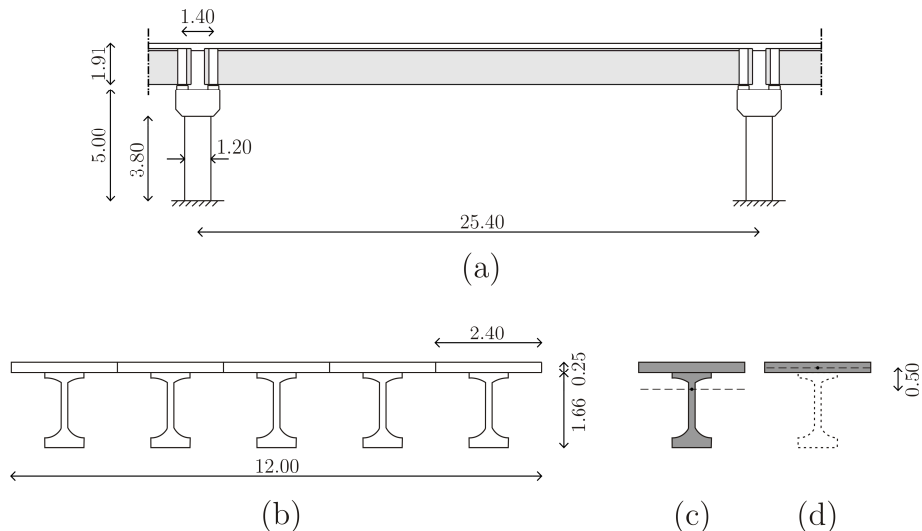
Elevation of a typical bridge span (a); detail of the deck (b); beam cross-section at an internal point of the span (c) and at the junction (d). The dimensions are indicated in m.
